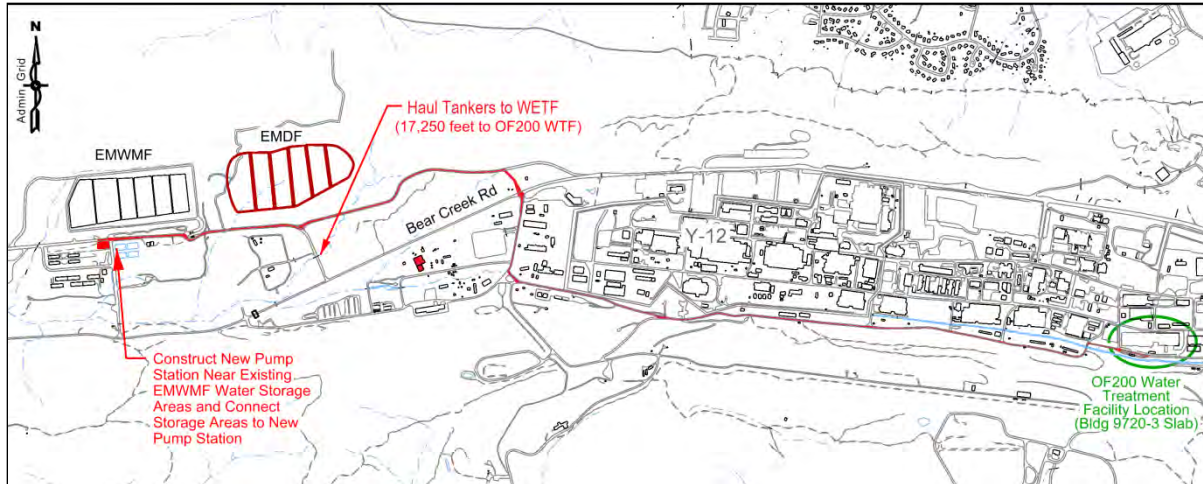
Alternative 4b: truck route to Outfall 200 MTF.
